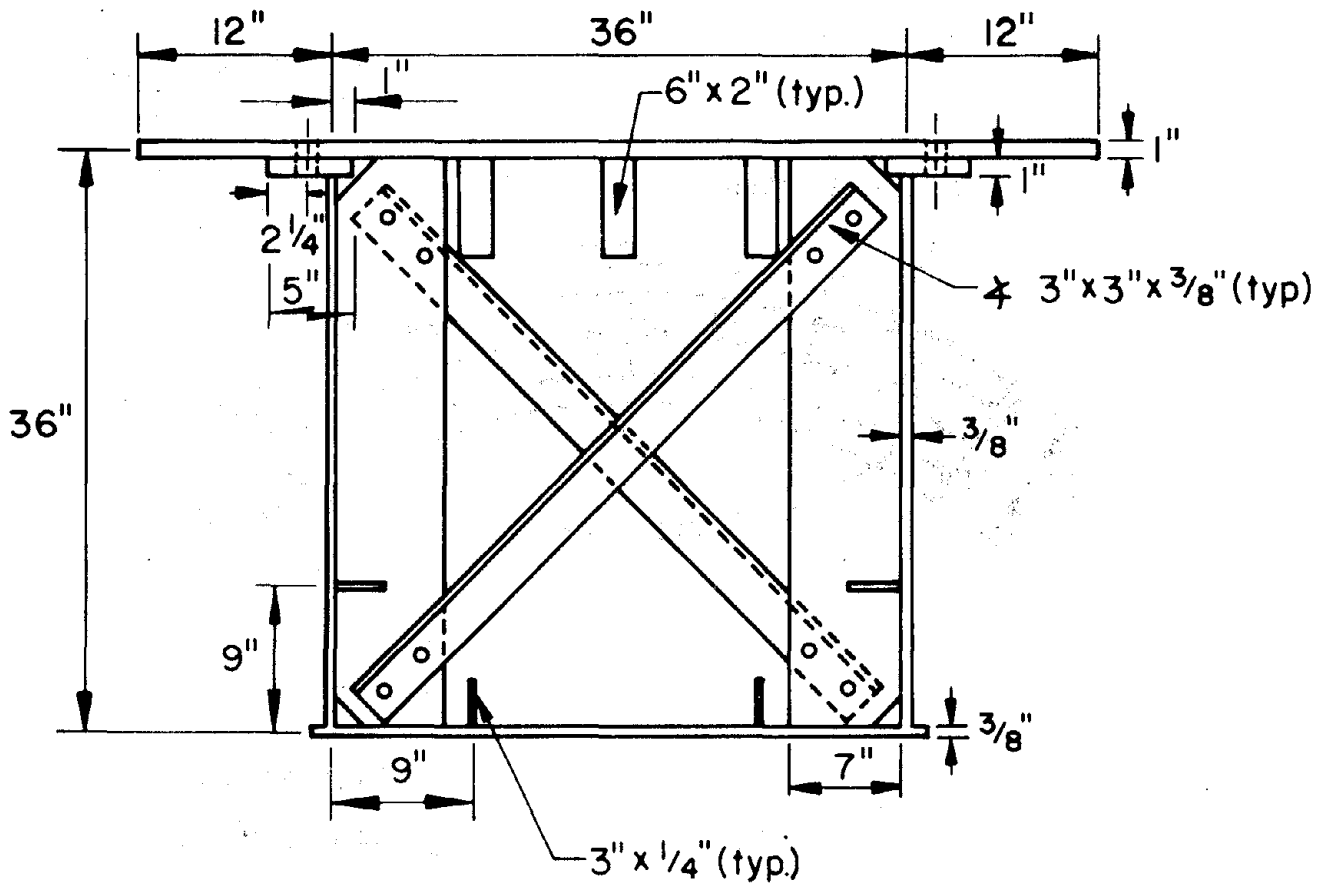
Box Girder Test Assembly 1 - Cross Section at Interior Diaphragms
